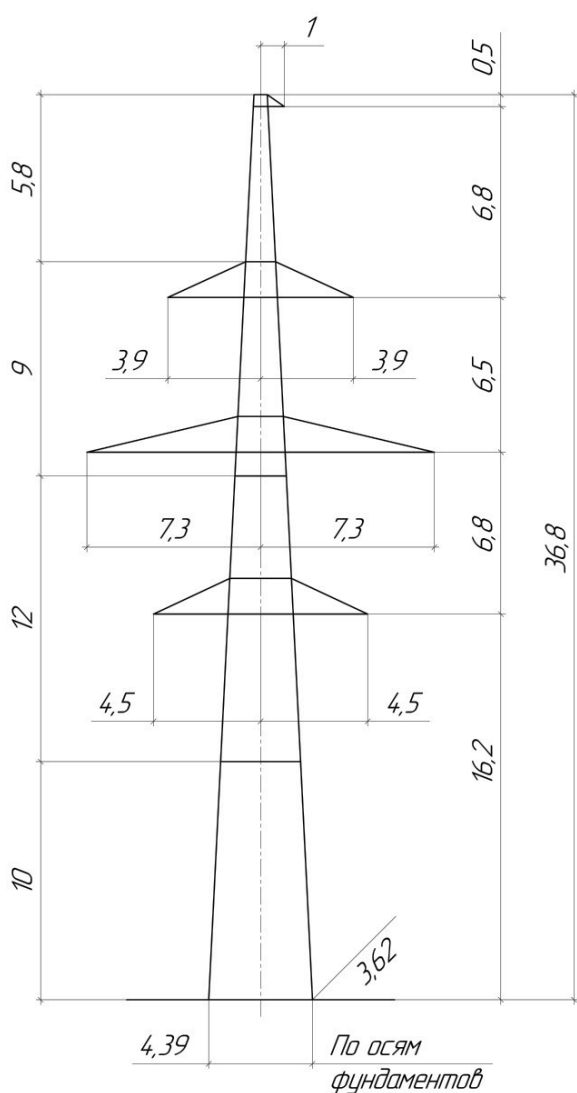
Support dimensions П220-2,4-9,3 overhead line.
